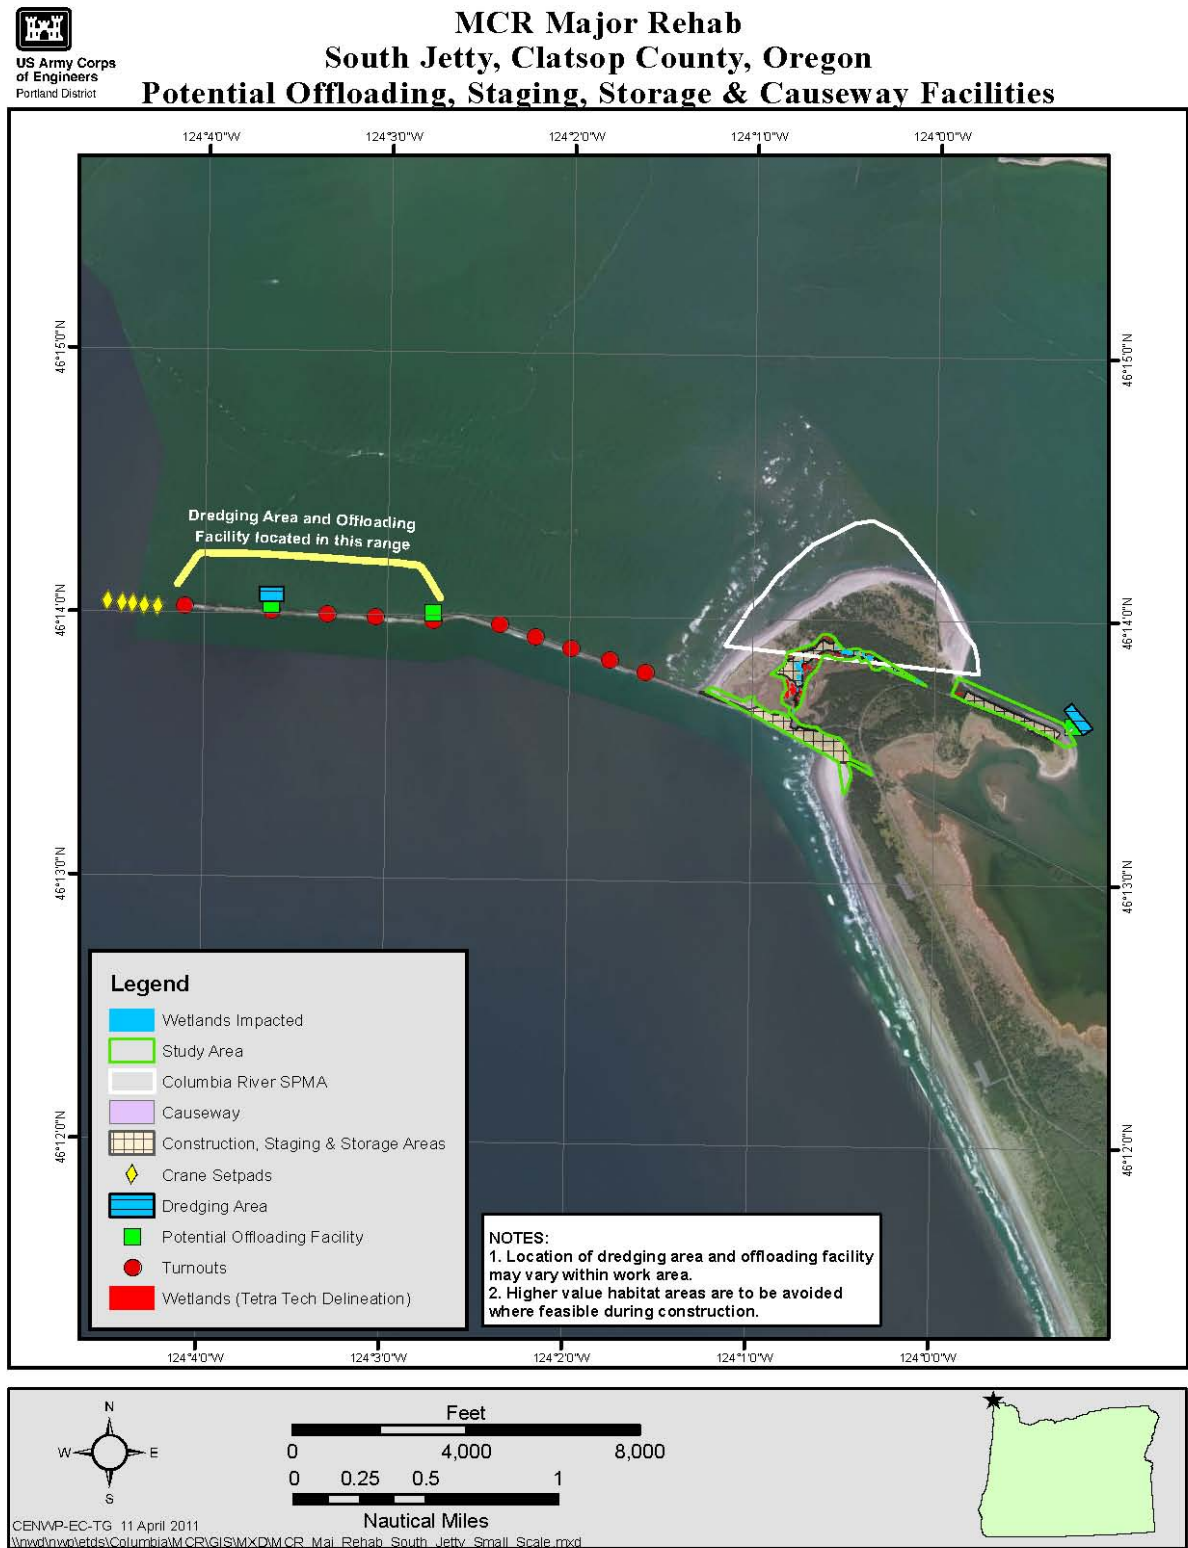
Jetty A Potential Offloading, Staging, Storage and Causeway Facilities
